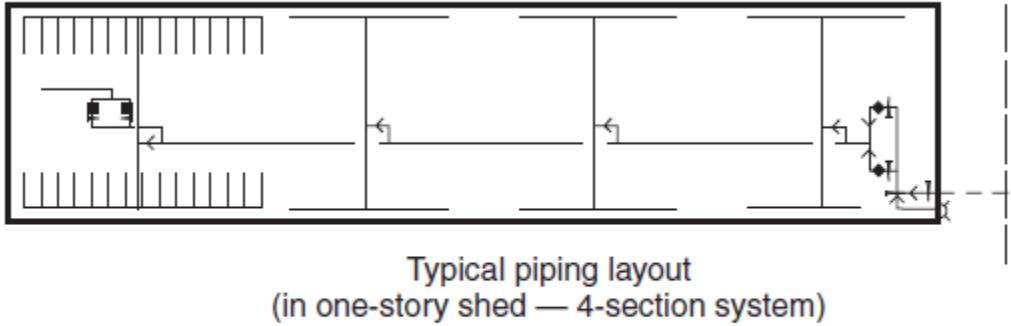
Typical Piping Layout for Combined Dry Pipe and Preaction Sprinkler System.
